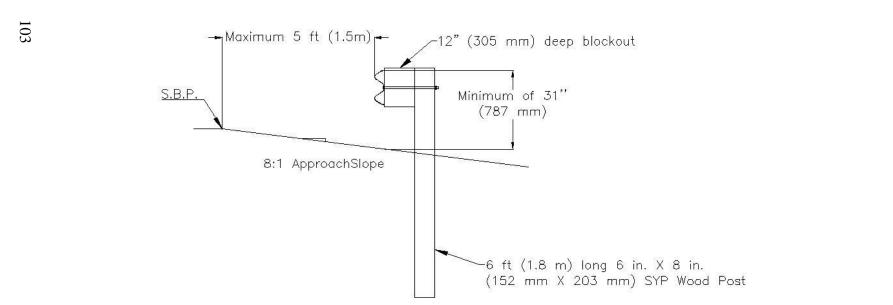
Use of SYP Wood Post MGS on 8:1 Approach Slope
